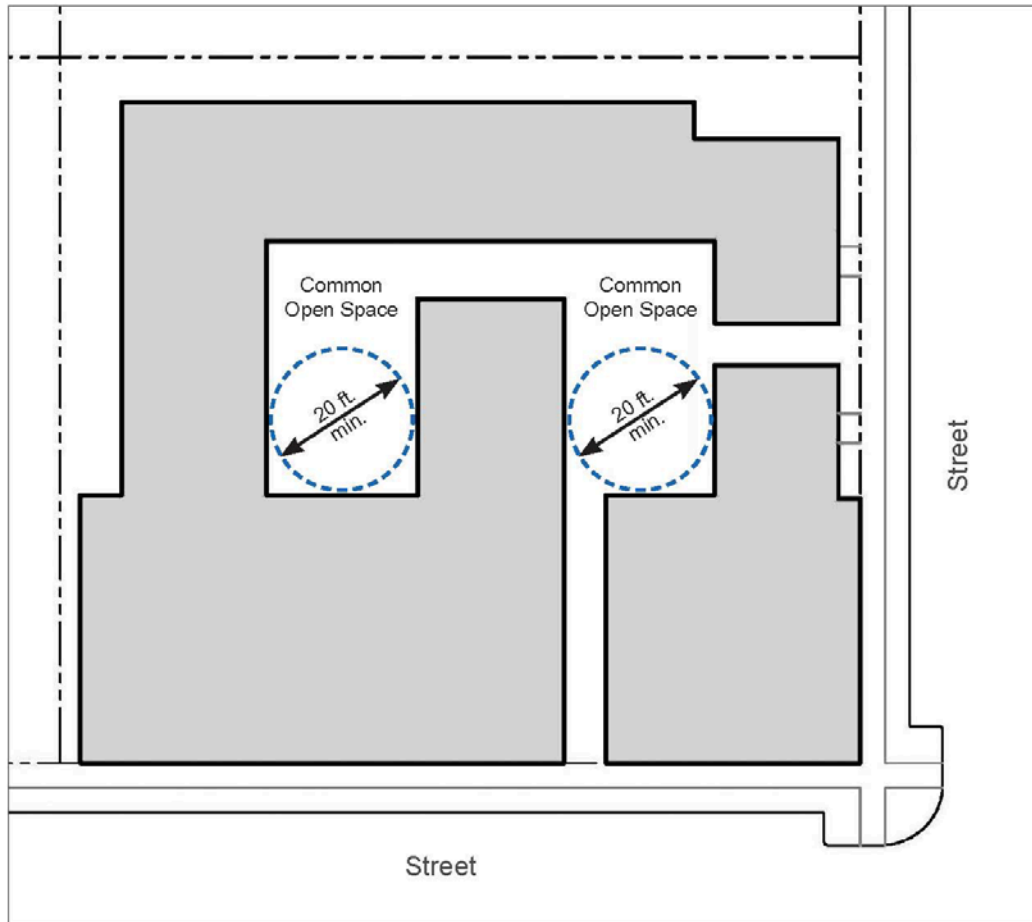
I.1.B: MINIMUM REQUIRED COMMON OPEN SPACE DIMENSION
